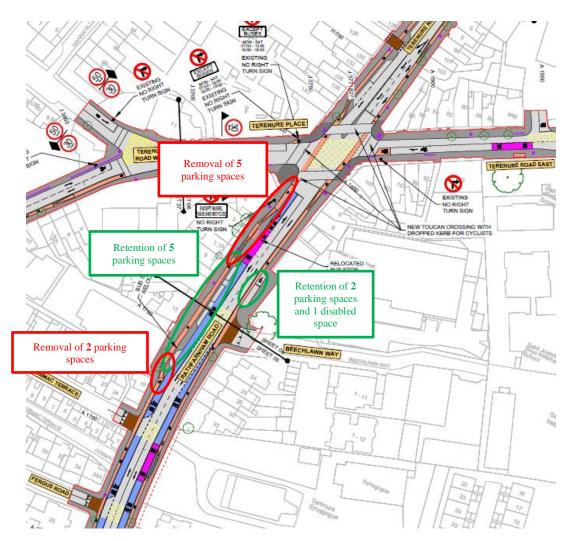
Proposed scheme design on Rathfarnham Road (south of Terenure Road East)
